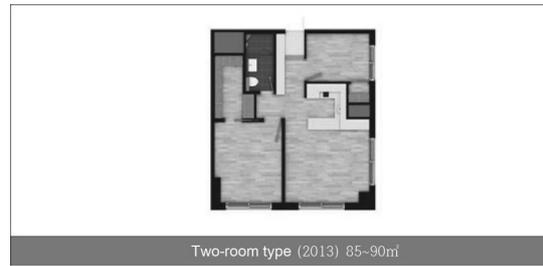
Typical two- to three-room type unit plan layout from 2013.
